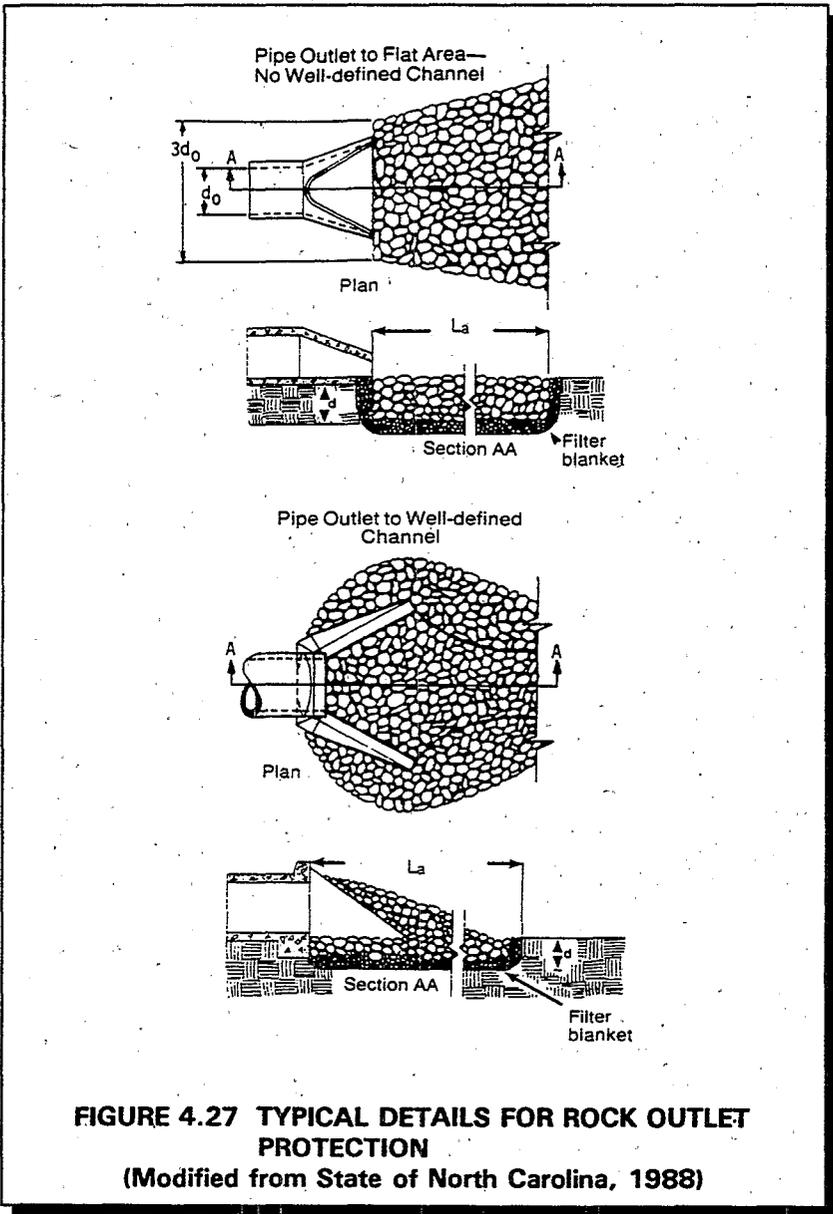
TYPICAL DETAILS FOR ROCK OUTLET PROTECTION
